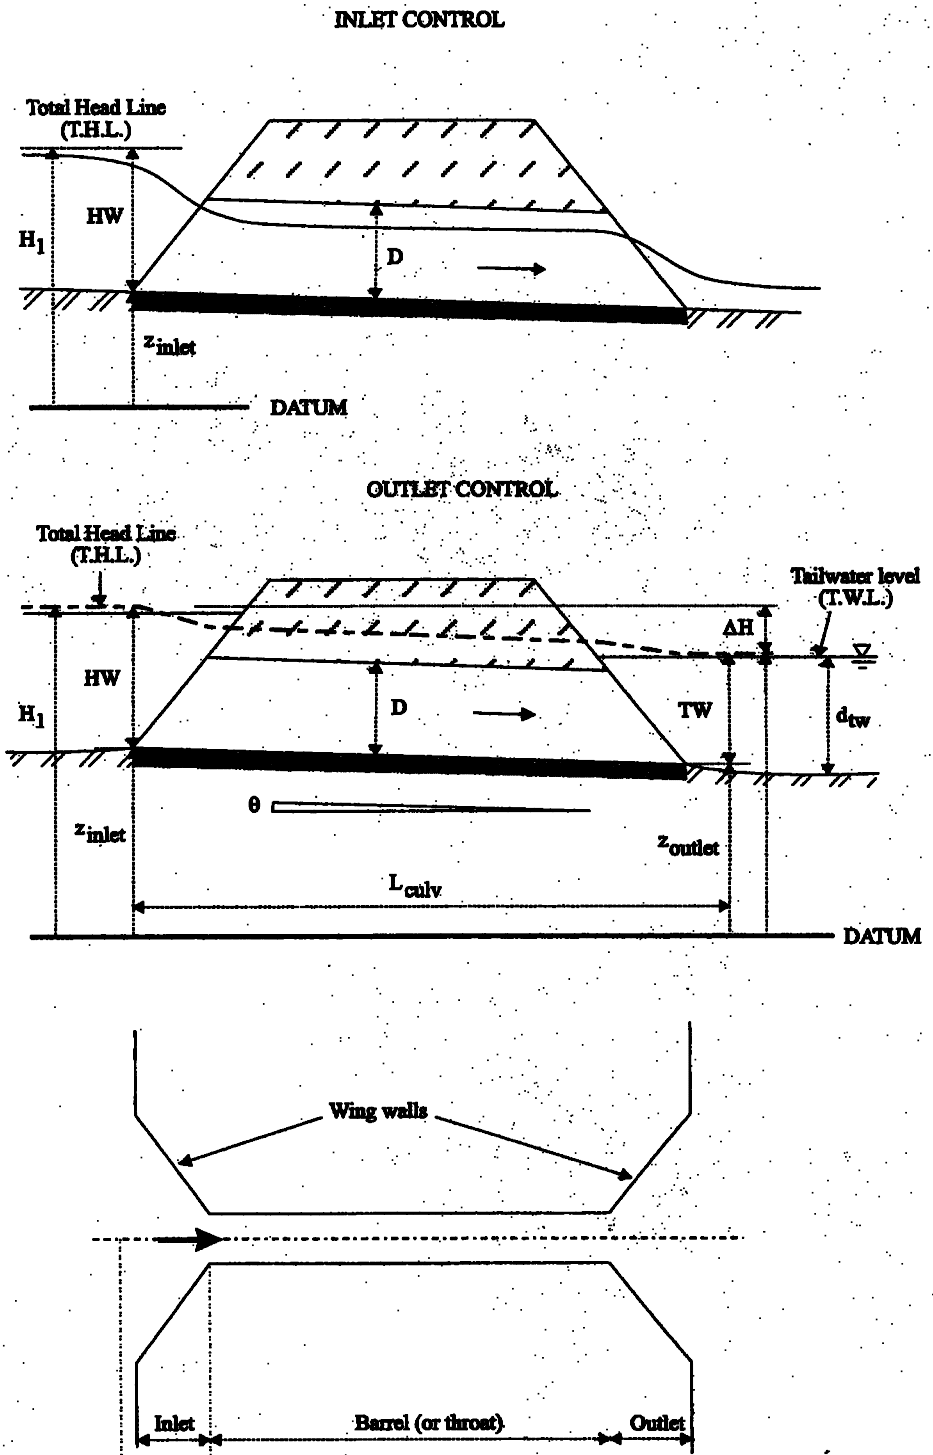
Sketch of a standard culvert operation: inlet control and outlet control.
